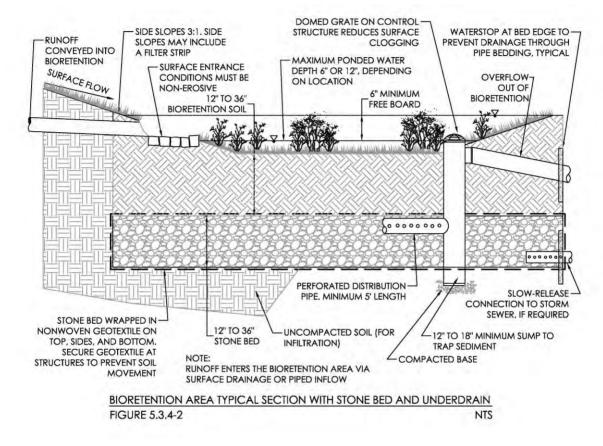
Typical bioretention detail (infiltration).
